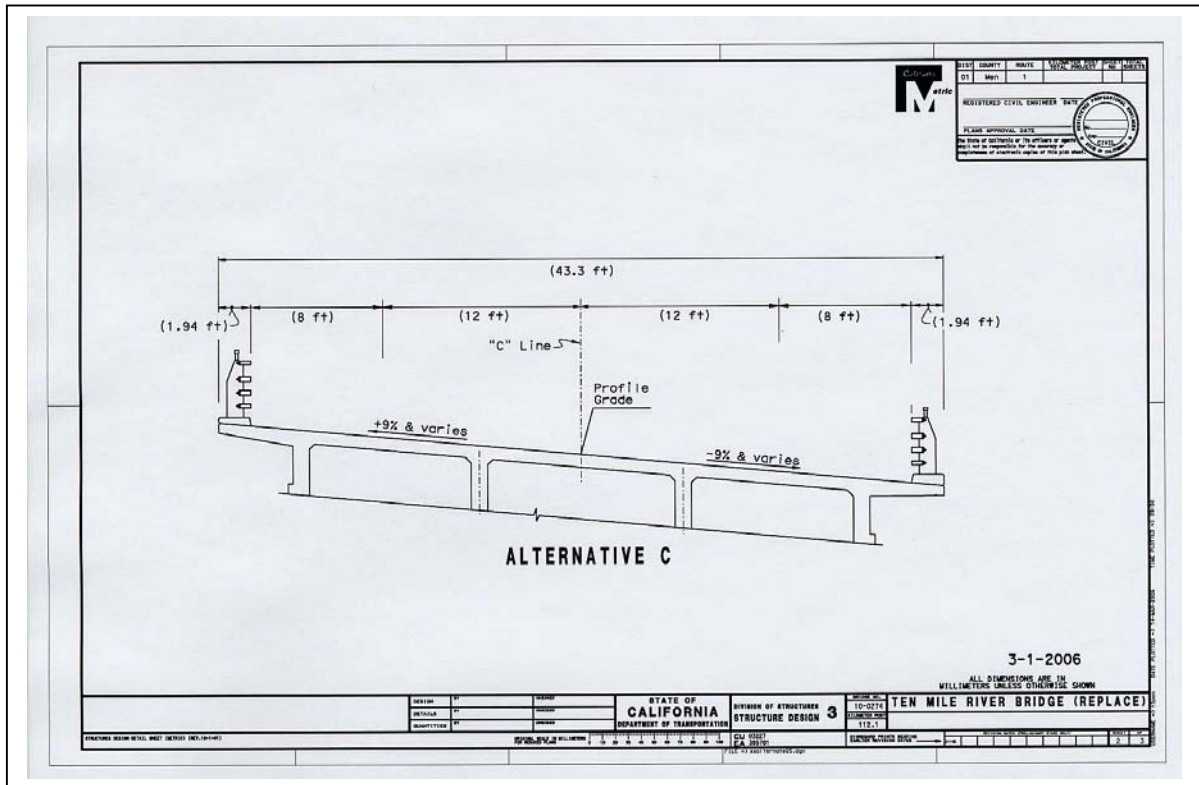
Typical Bridge Cross-Section For Alternative C
